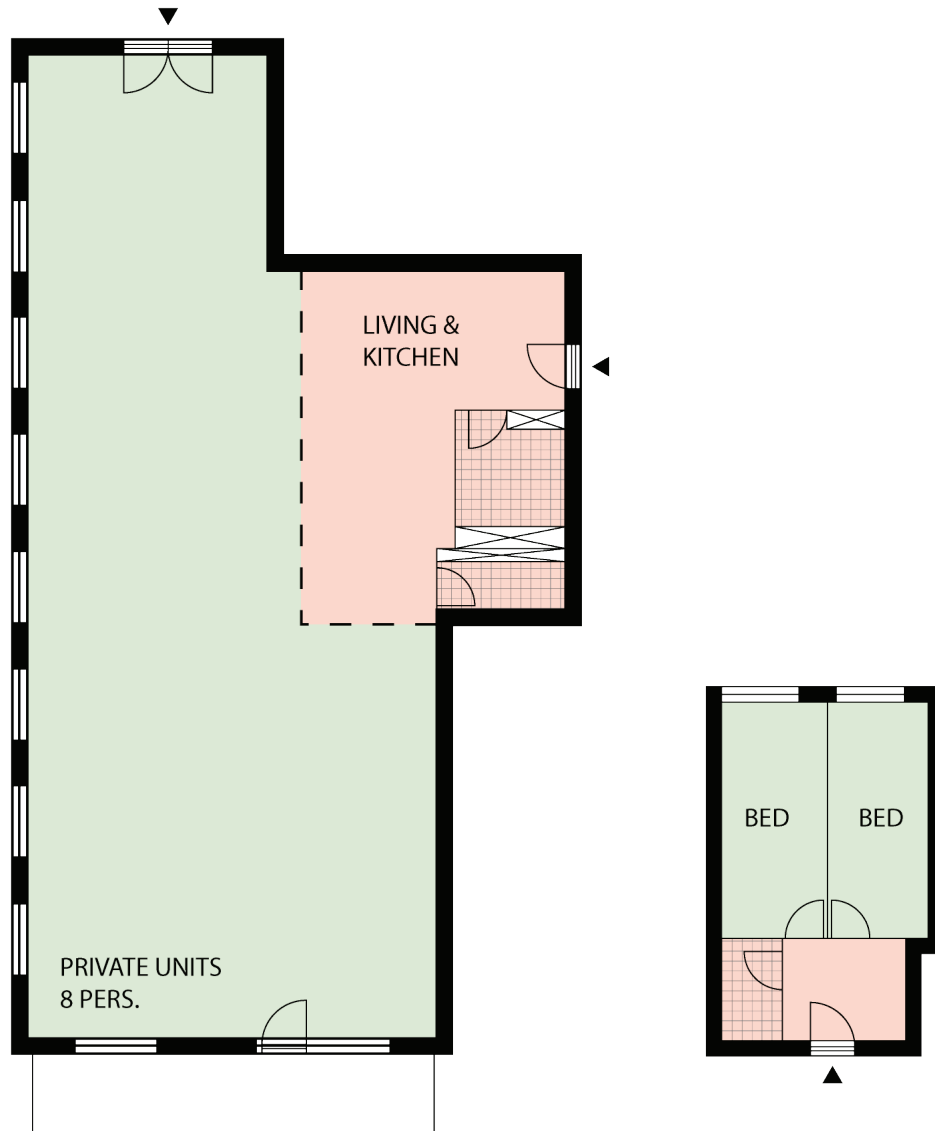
(Left) *Selbstausbau* DIY apartment in Warmbächli, 1:200. Drawing by author.
